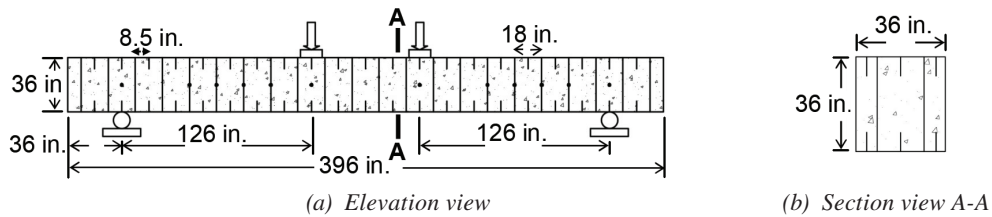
SC wall four-point bending test (Sener and Varma, 2021).
